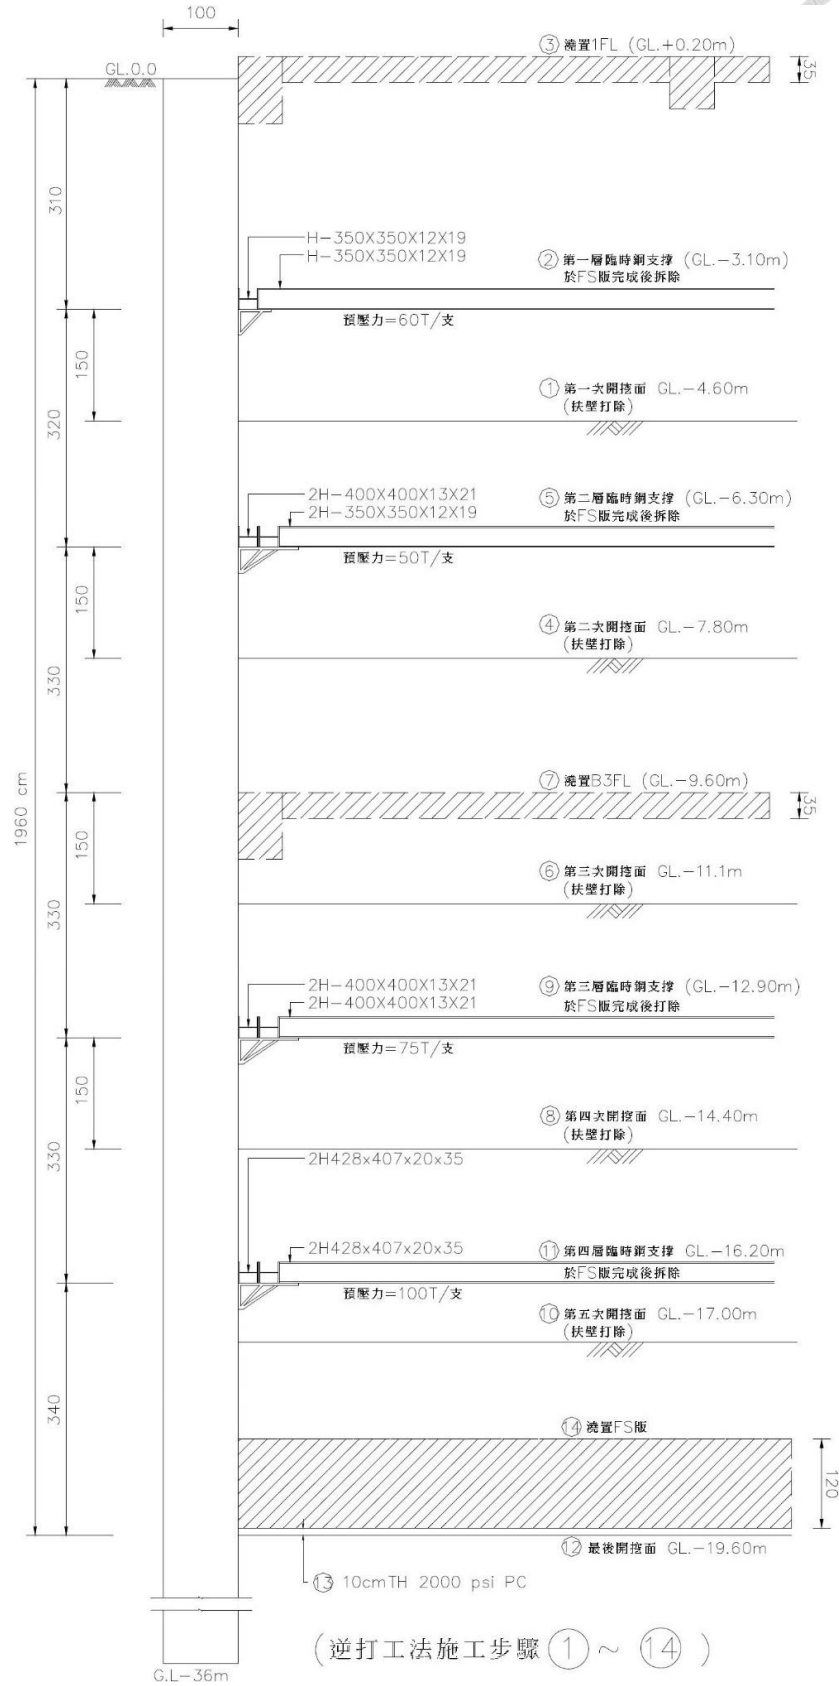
8 Cross sections of warehouse district retaining system in Case B.
